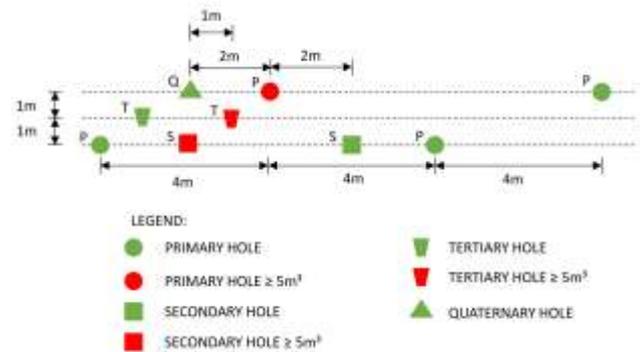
Proposed Fissure Grouting Pattern
